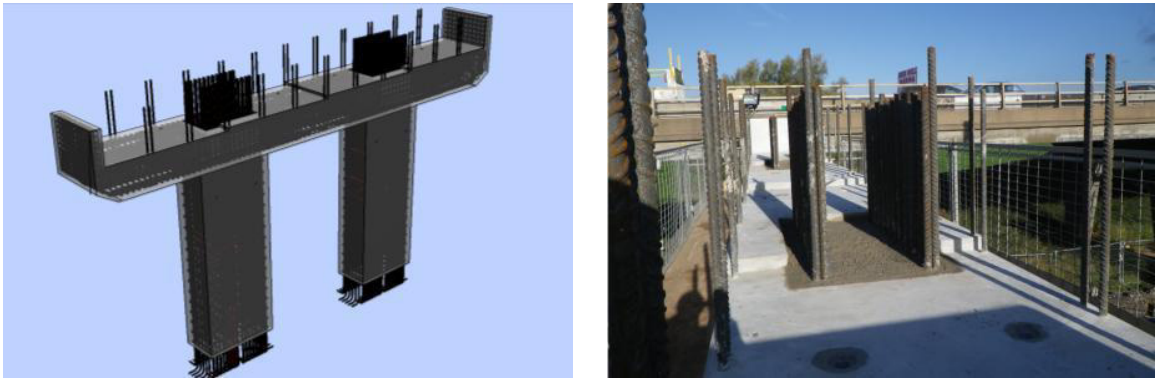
Interface details between the precast crosshead and the precast pier (Image from Laing O'Rourke): (a) 3D view of the precast crosshead and precast piers; (b) A photo of the connection between the two components
